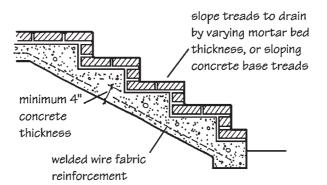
Brick steps using flat pavers and bricks on edge. (*From Beall*, Masonry and Concrete for Residential Construction, *McGraw-Hill Complete Construction Series*, 2001.)
